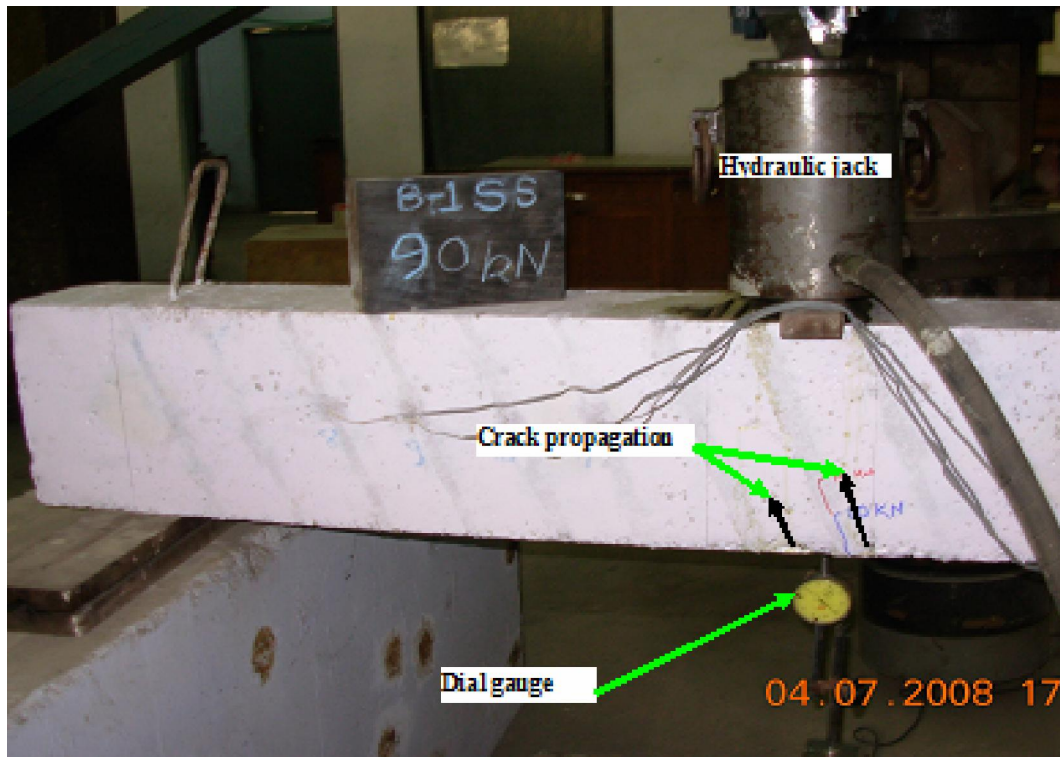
Test B1-SS crack pattern at 90 kN (Face SE)
